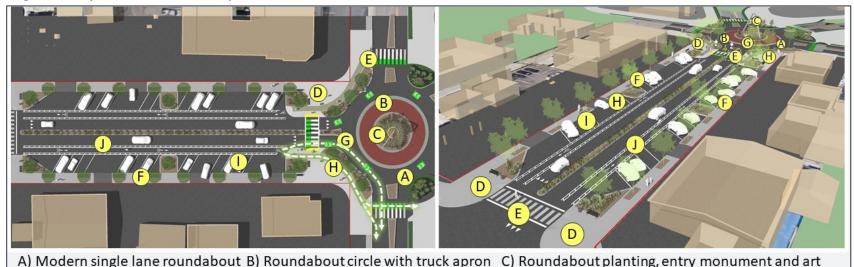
shows the plan and angled views for implementation phase 2 for a typical block, using Cordoba Avenue to Granada Avenue as an example. Implementation phase 2 uses all of the 100 feet public right-of-way. The improvements assume the closure of about one-third of the driveways.
